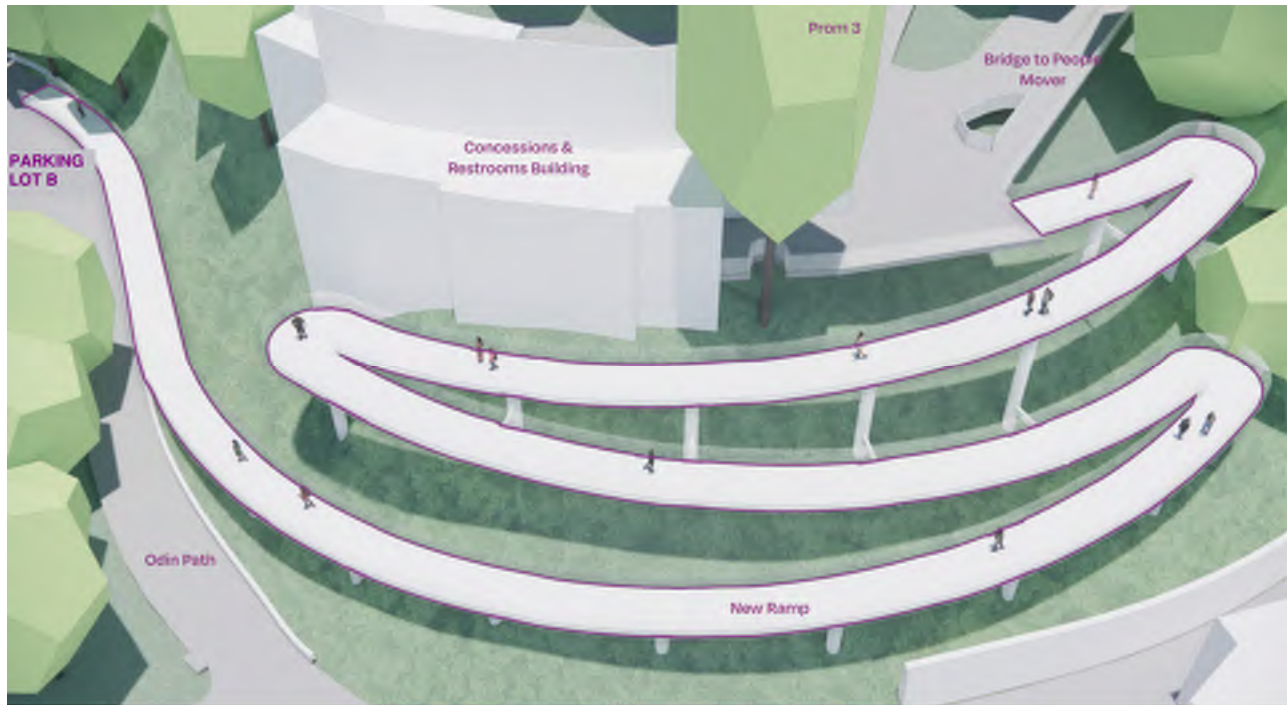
Prom 3 Exit Ramp – Illustrative 3D view
